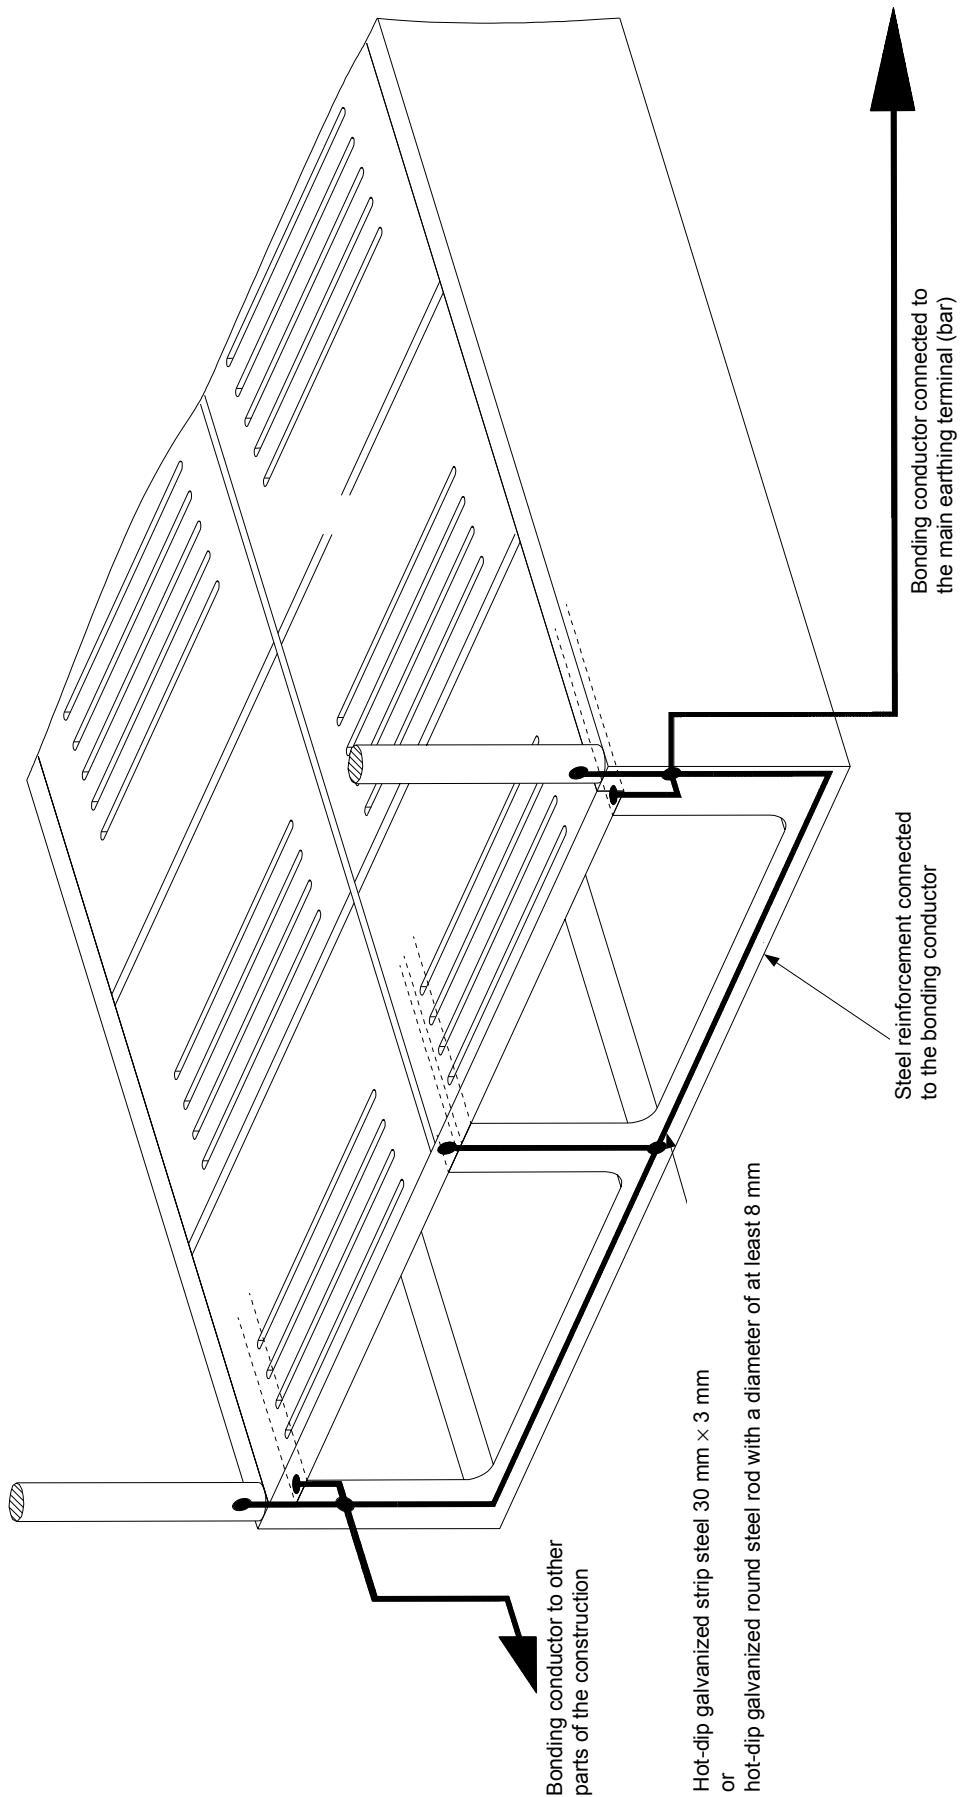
Example of equipotential bonding applied to the concrete construction with spaced floor for collection of manure
